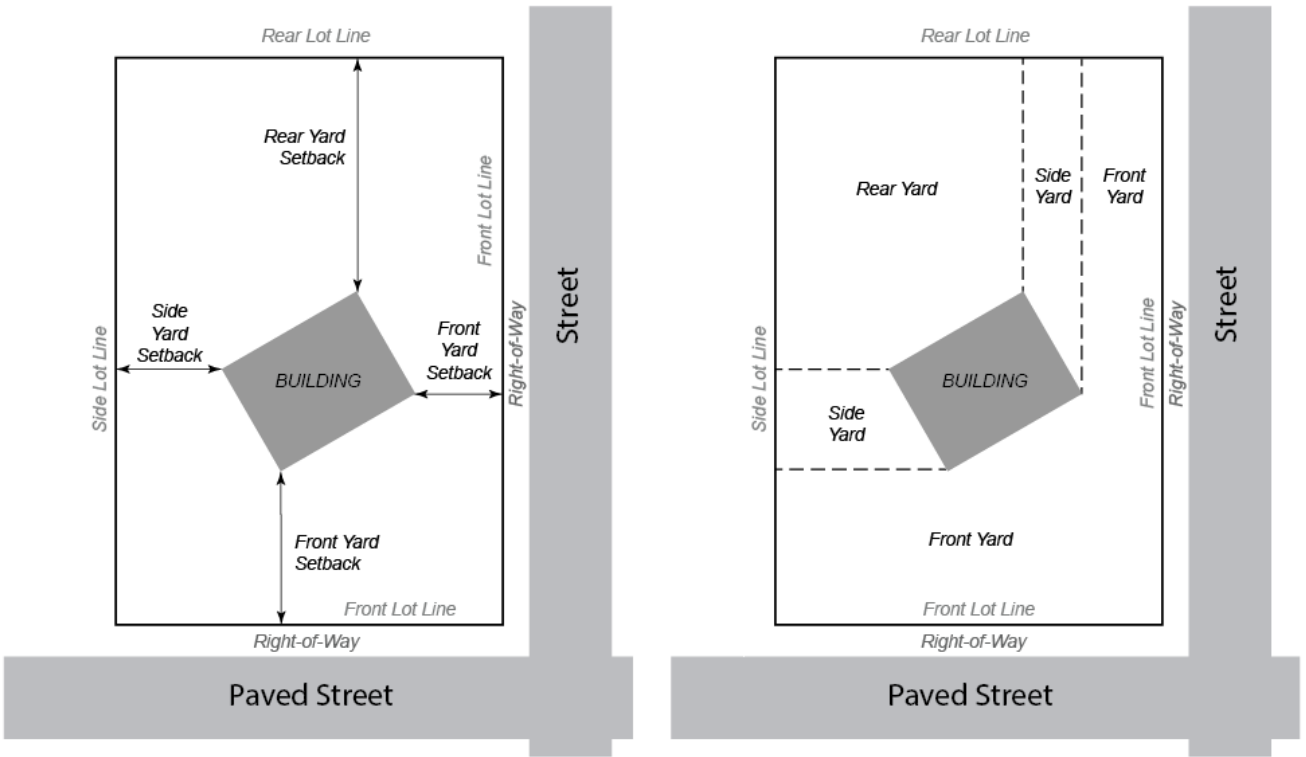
E: Typical setback and yard locations for a corner lot where the building is oriented toward the corner of the lot.
